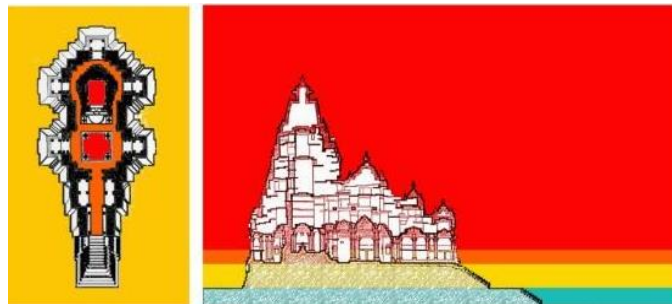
Plan and section of Kandarya Mahadeva temple, Khajuraho
